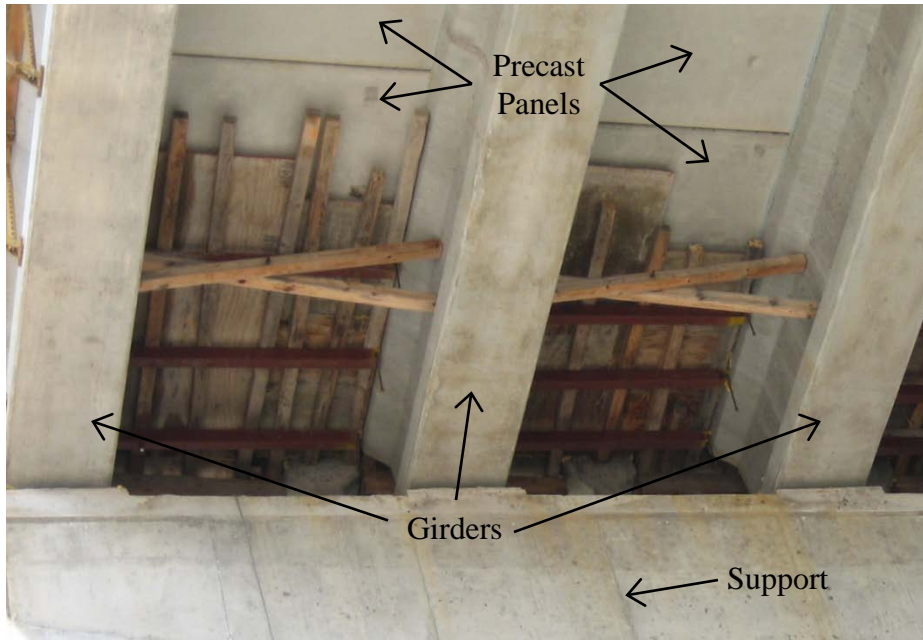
Temporary Formwork Erected for IBTS Detail (Agnew 2007)
